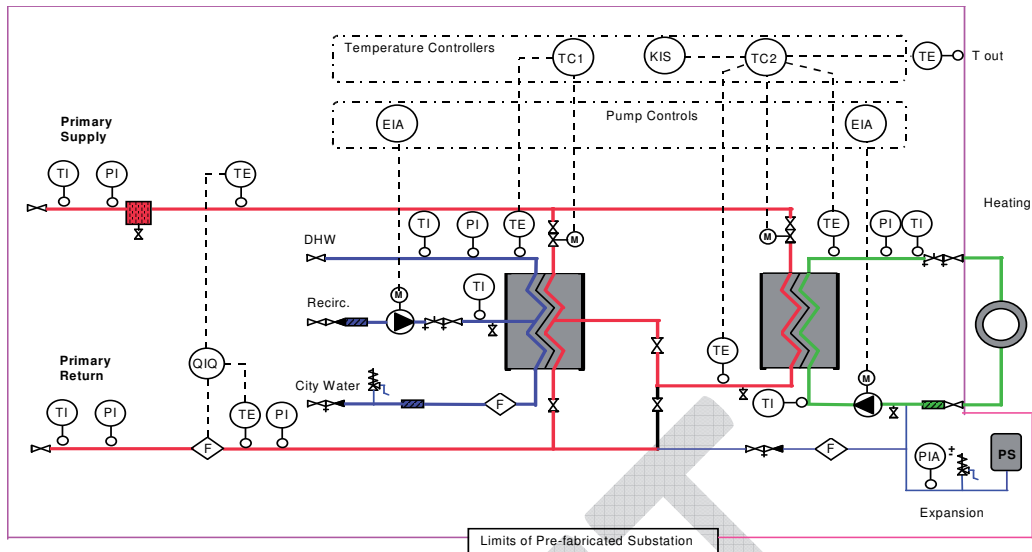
Typical Substation Connection Arrangement (image courtesy of LDA/GLA)
